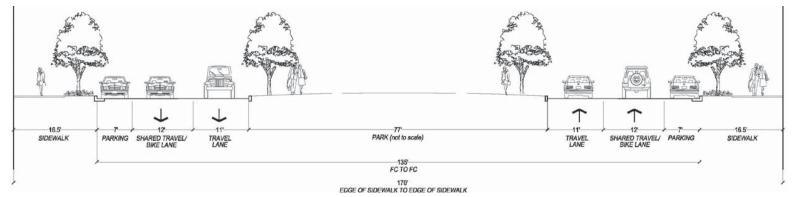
Recommended mid-block cross-section of 15th Street S. looking west between Crystal Drive and S. Clark/Bell Street Note: 14th Street S. is not shown in this cross-section since it is recommended to be removed
